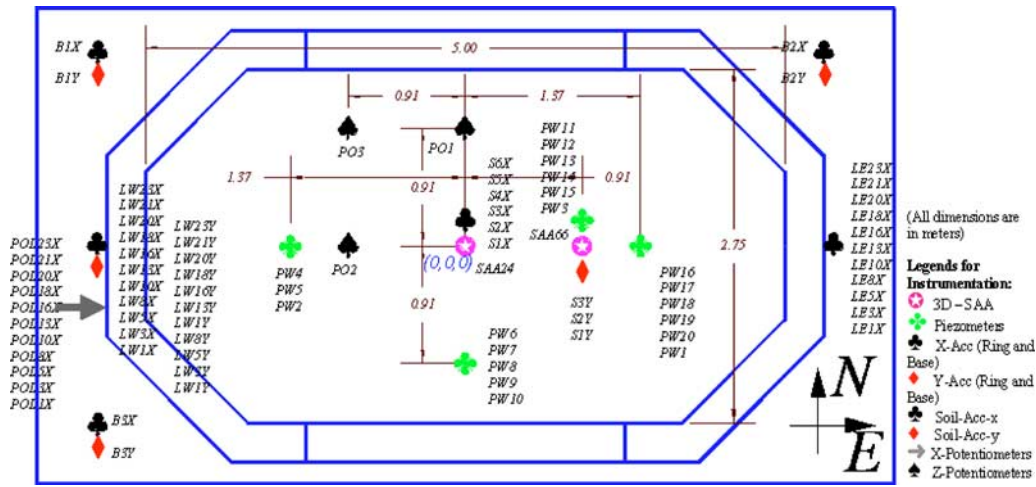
Instrumentation plan: LG-0 (plan view only) (additional details are available in Bethapudi 2008).
